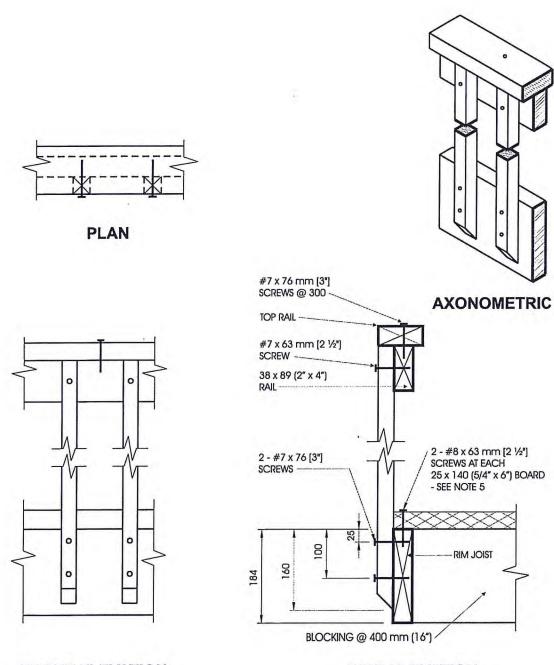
Exterior Connection: Cantilevered Picket Screwed to Rim Joist
